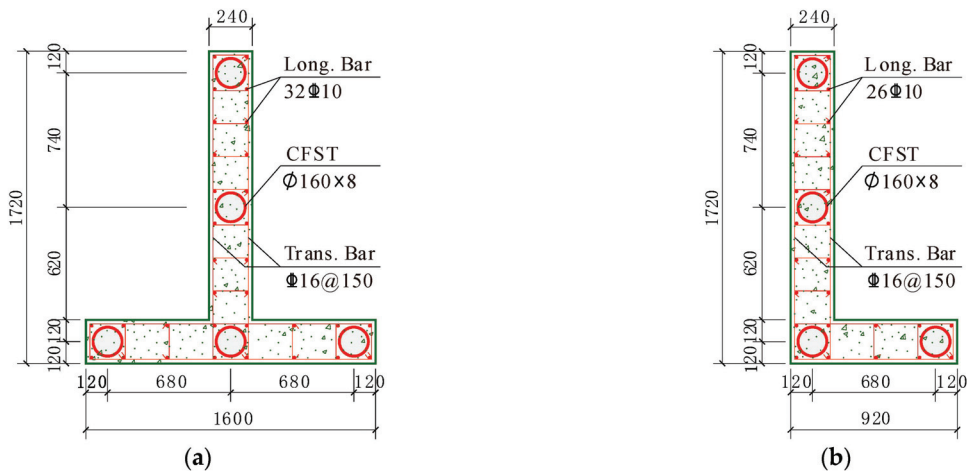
Dimensions and reinforcement details of the wall piers in the prototype structure (Unit: mm): (a) T-shaped wall pier; (b) L-shaped wall pier.
